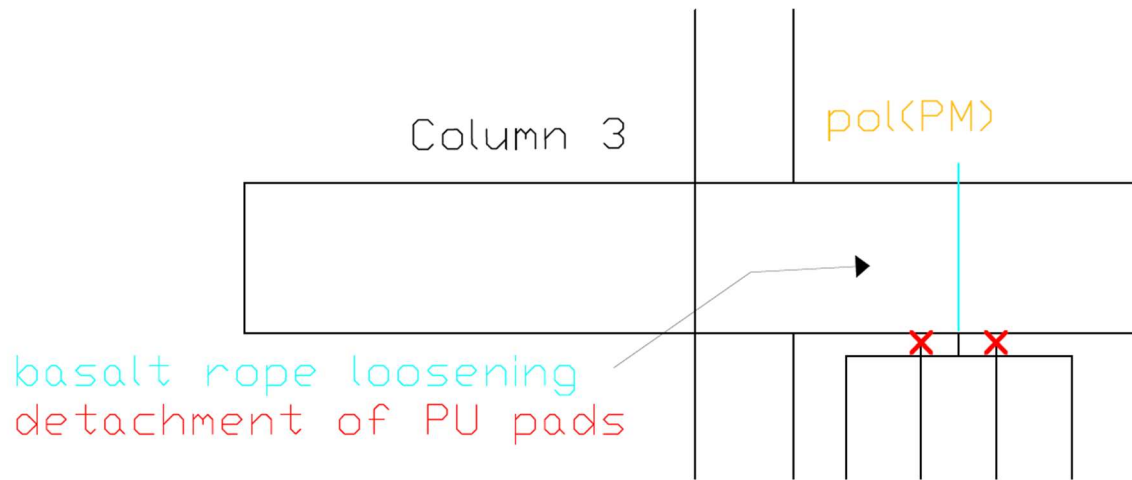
Anchoring details and PU pads dimensions (under the top slab), left living wall LW3-2L: detachment of PU pads after EQ1.4g
